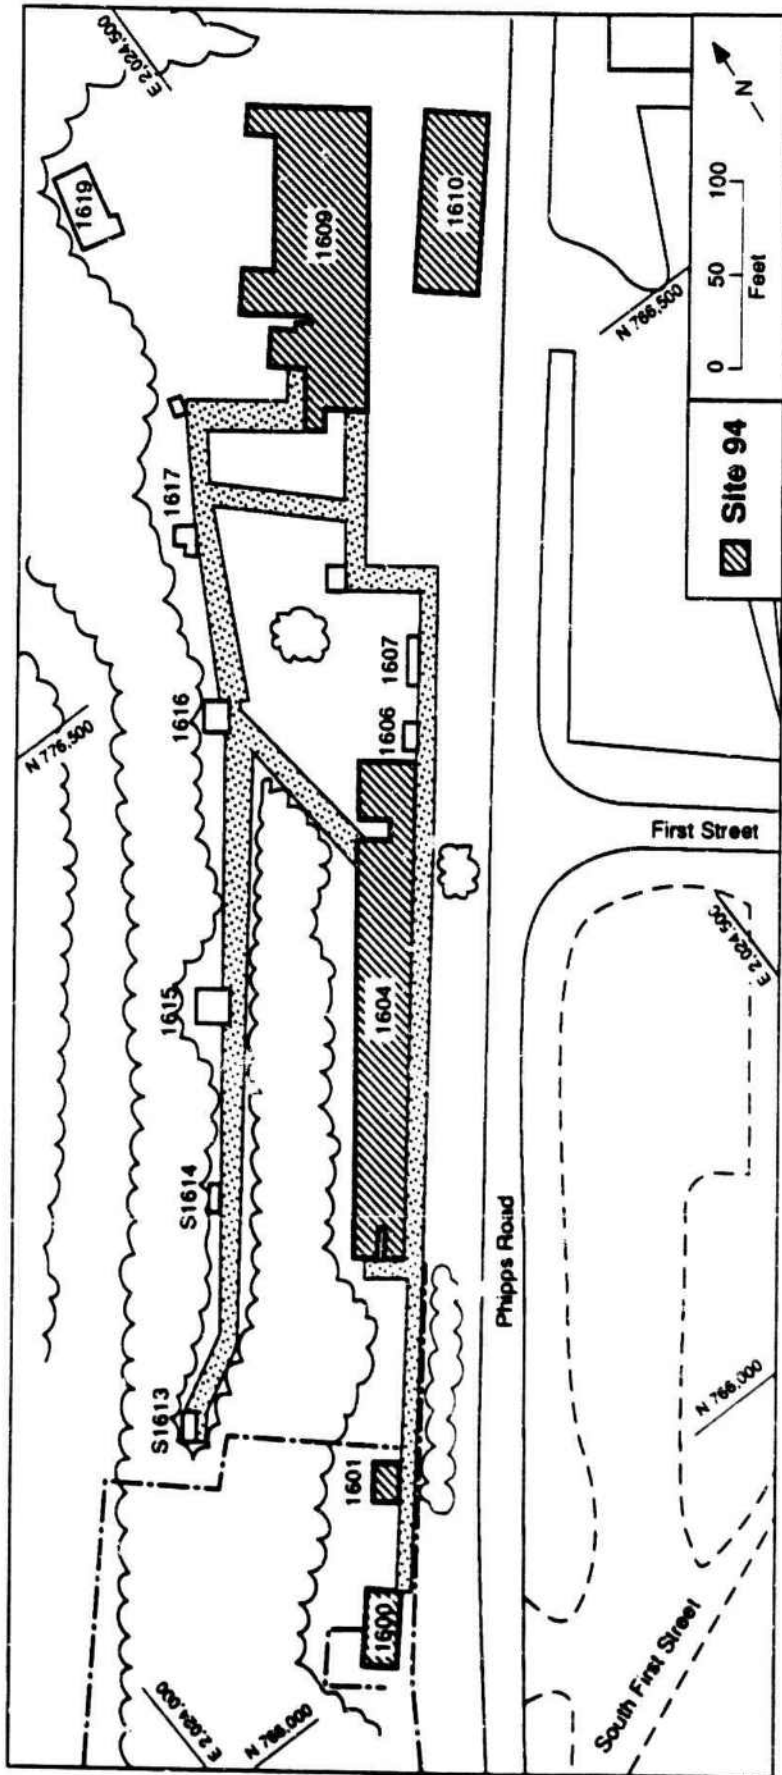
Layout of Site 94, Buildings 1600, 1601, 1604, 1609, and 1610 (Source: Adapted from USACE 1984b)
